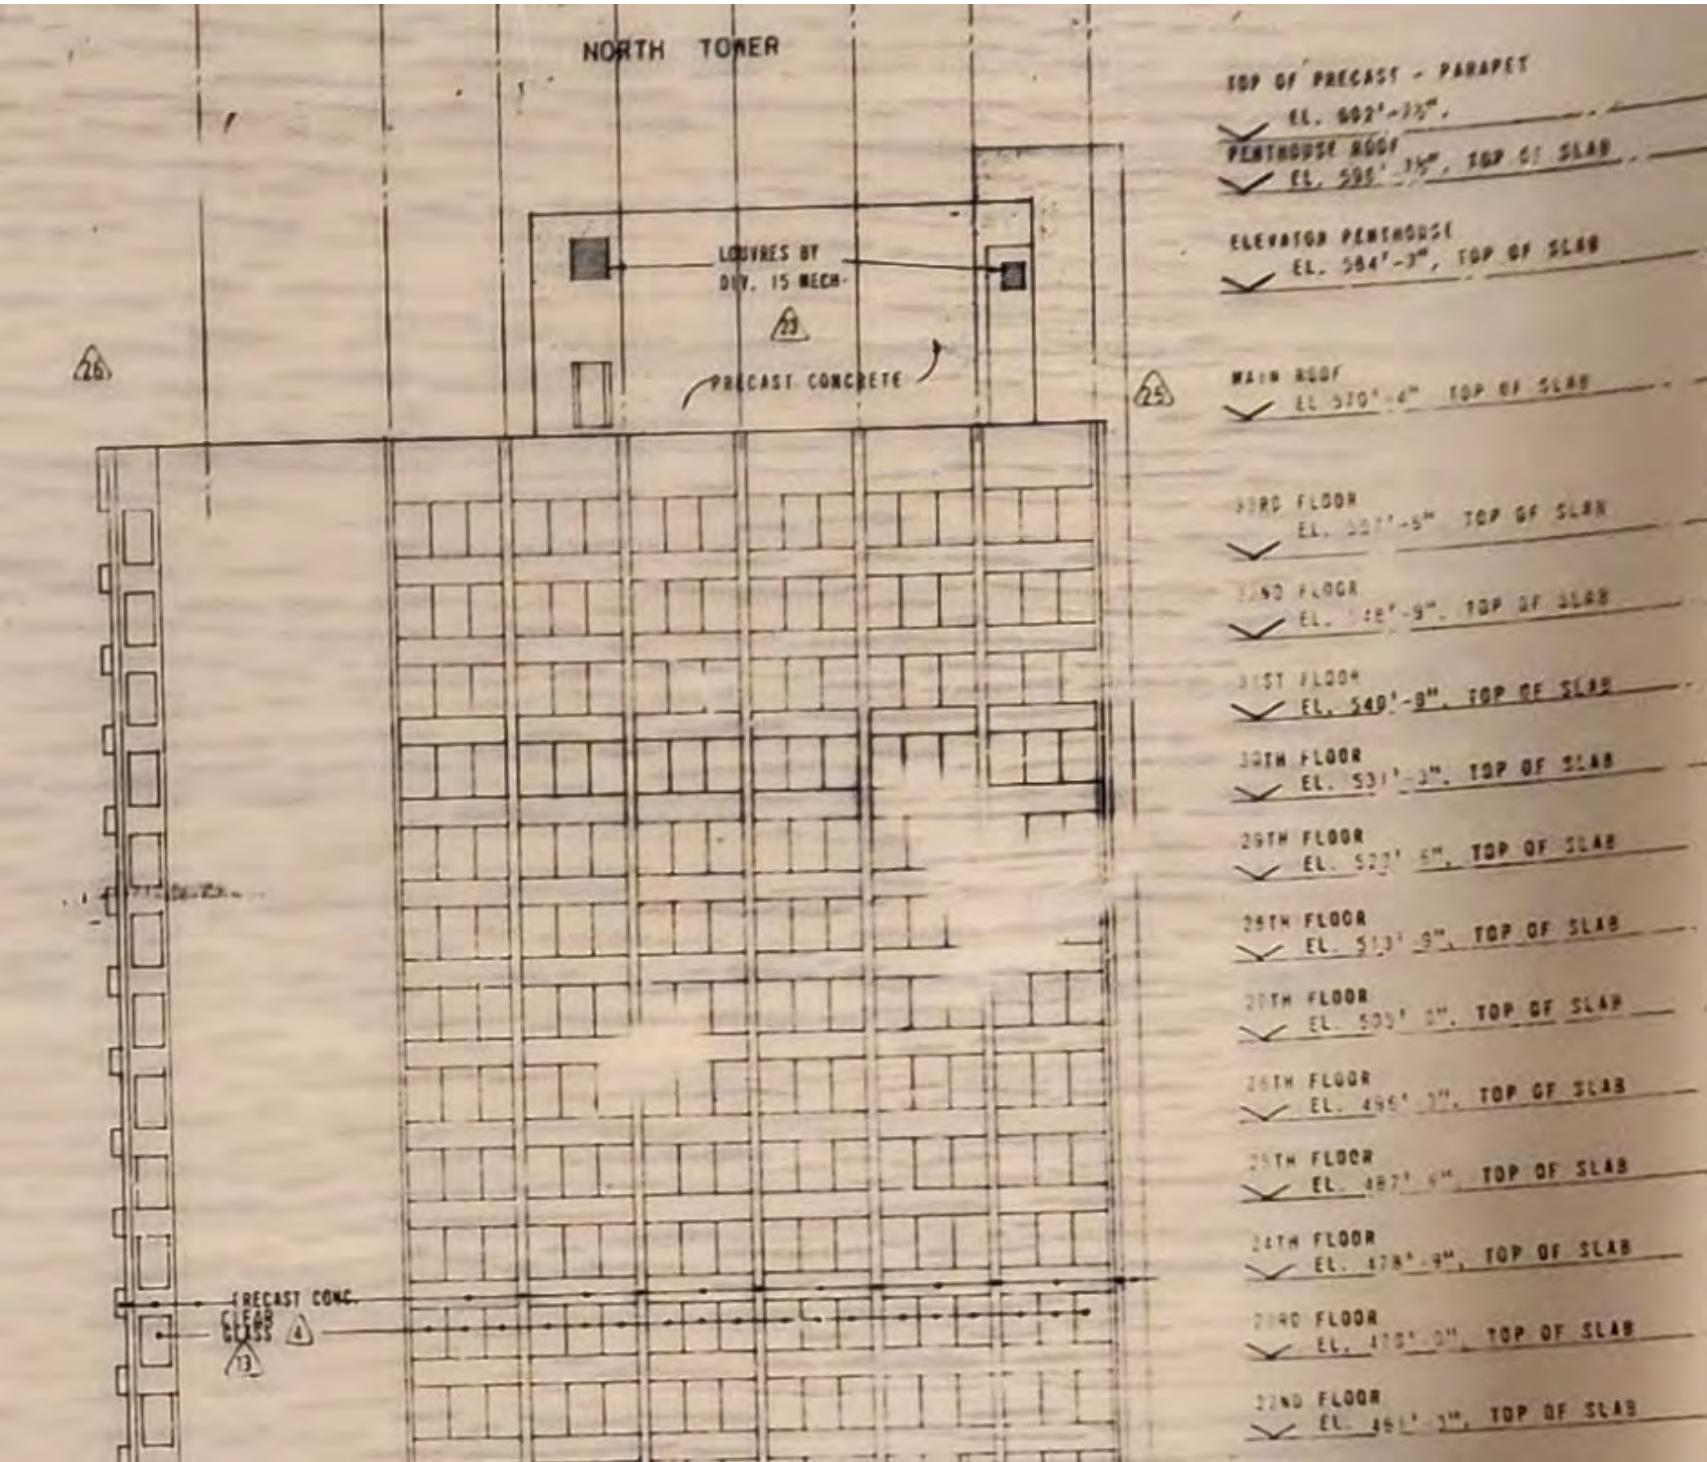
Detail of drawing showing east elevation of the north tower, 1973 (Campeau Corporation).
